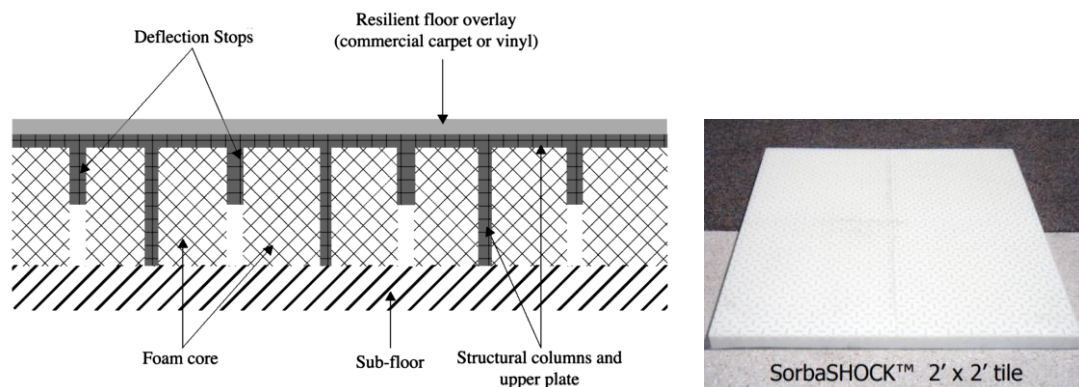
SorbaSHOCK flooring structure⁸¹
